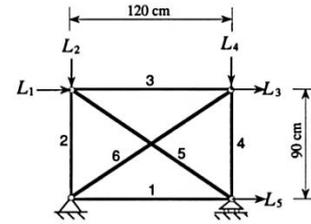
statically indeterminate 6-member truss structure (Thoft-Christensen and Murotsu 1986)
